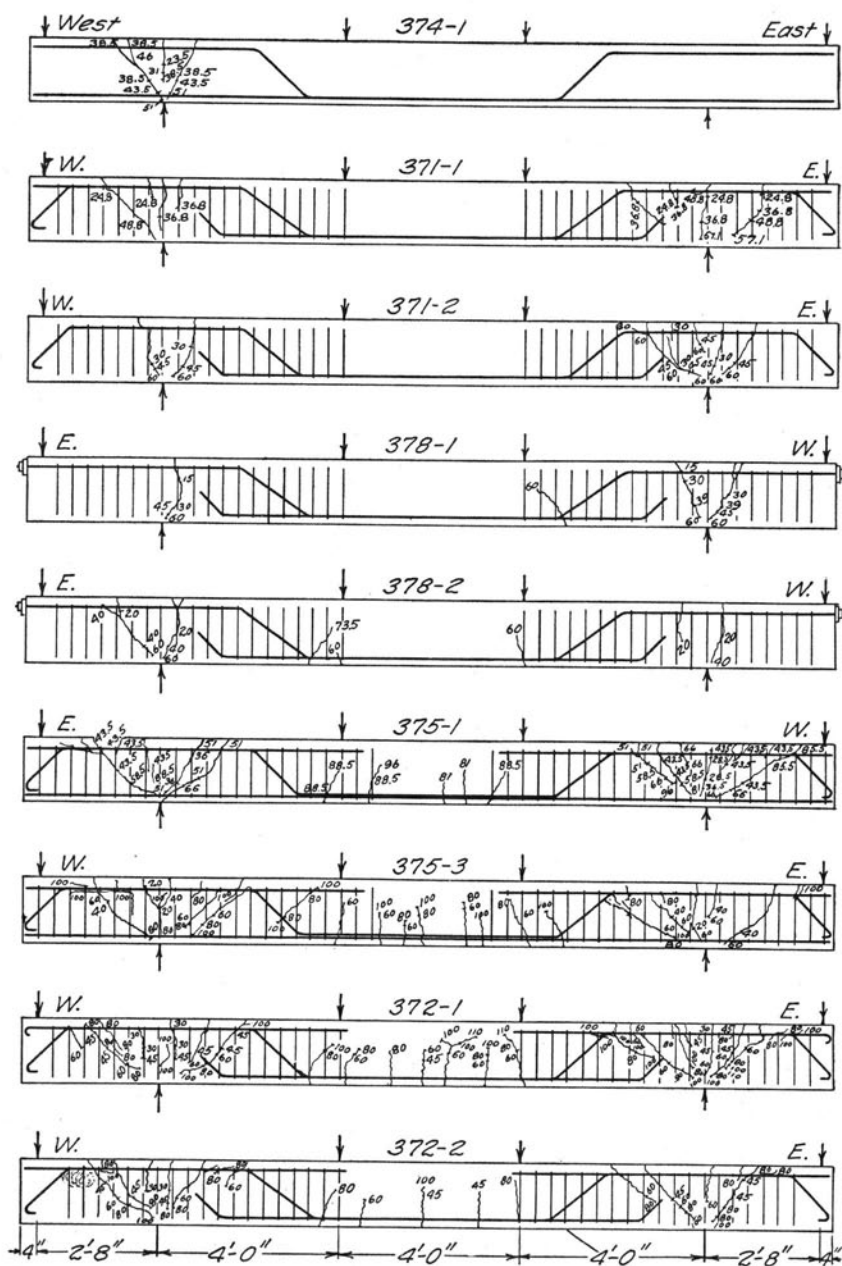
SKETCHES OF BEAMS AFTER FAILURE, SERIES OF 1911
